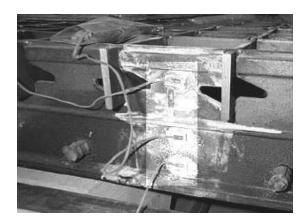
Foil Gage Installed On Deck Specimen (Keelor)
